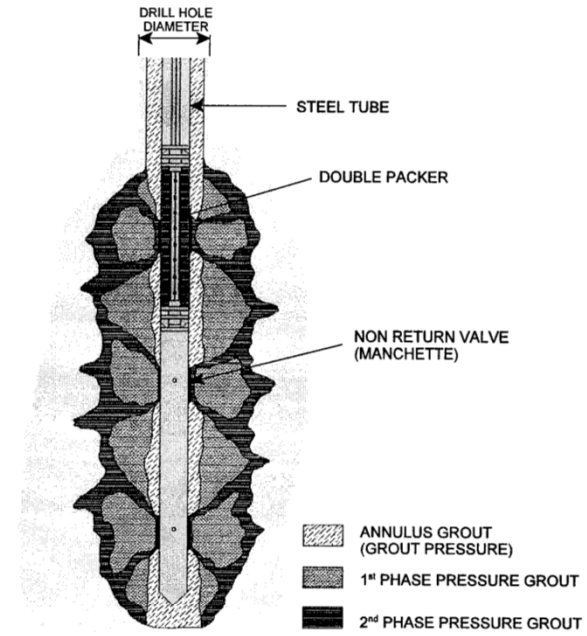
7. Use of Reinforcement Tube as a Tube à Manchette Postgrouting System
